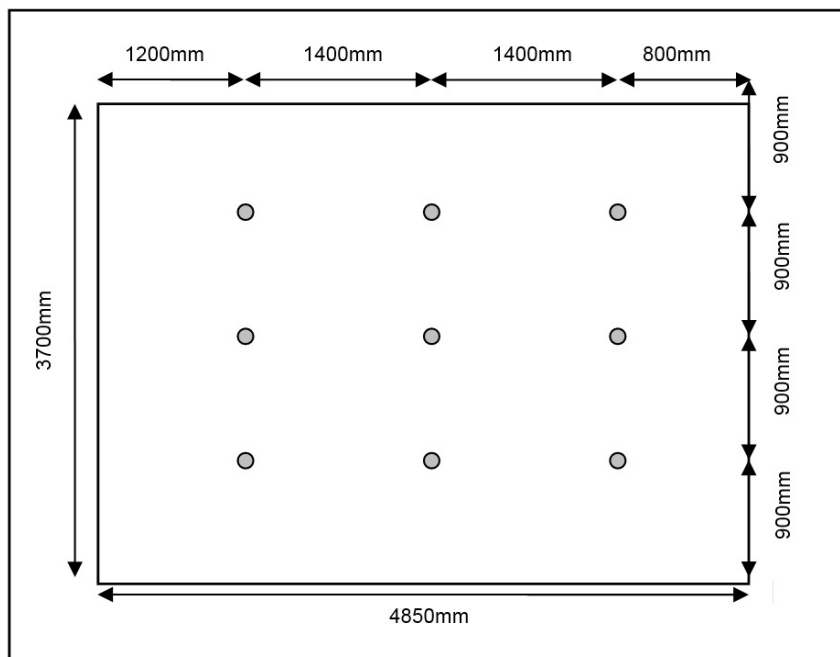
Positions of the downlights in the ceiling of the Robust Details Appendix F floor
